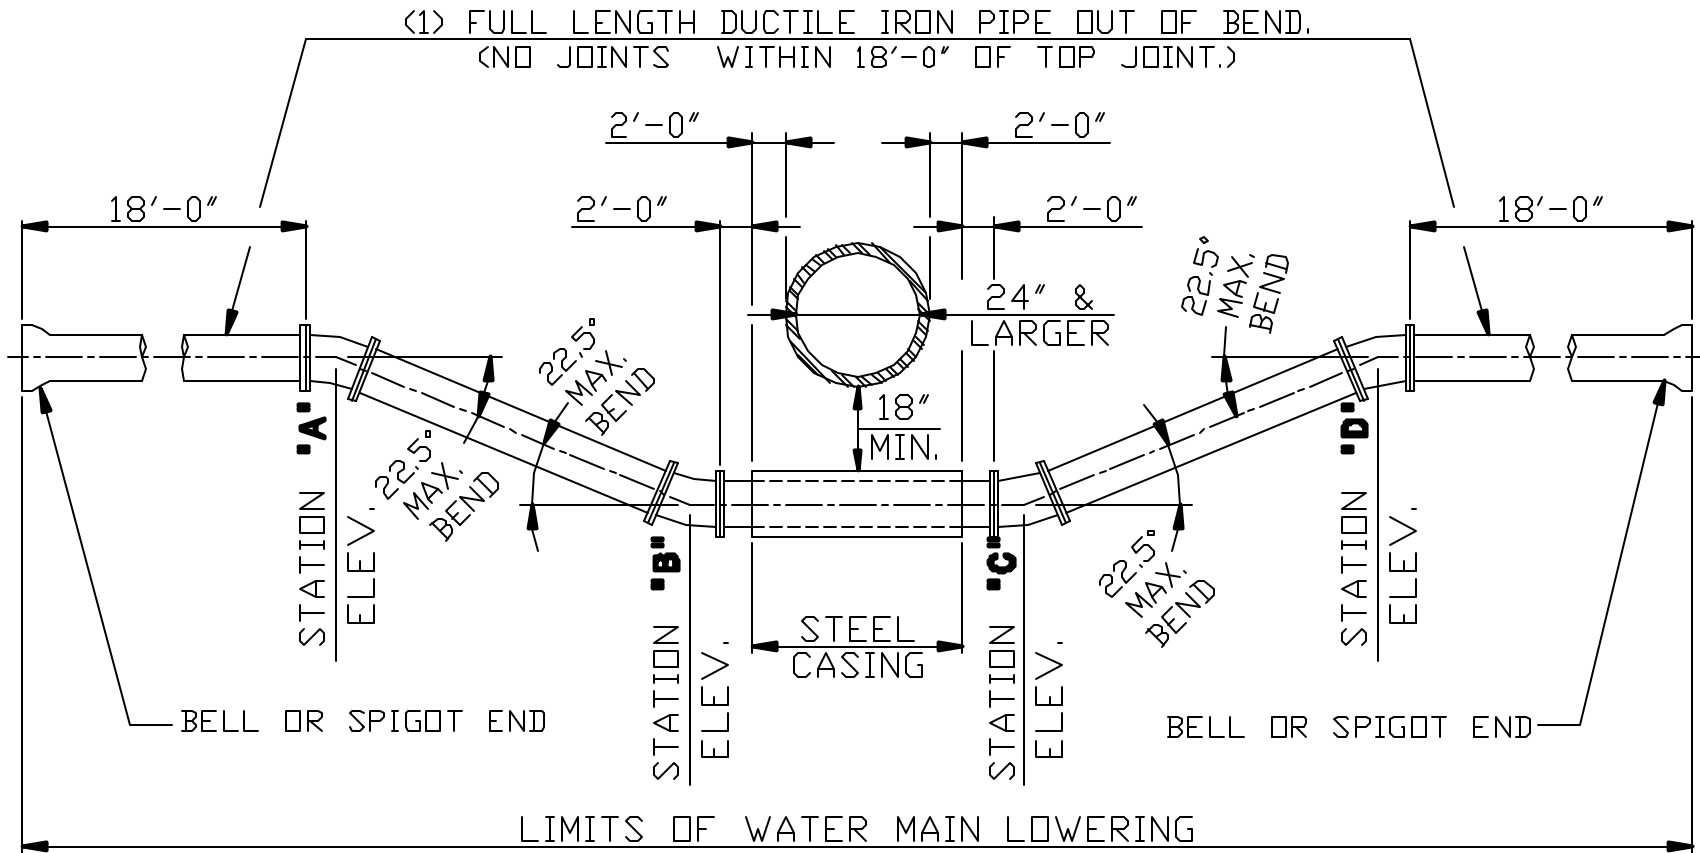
DETAIL FOR WATER MAIN LOWERING UNDER OBSTRUCTIONS 24" & LARGER IN DIAMETER OR WIDTH FOR 'EXISTING CONSTRUCTION'
